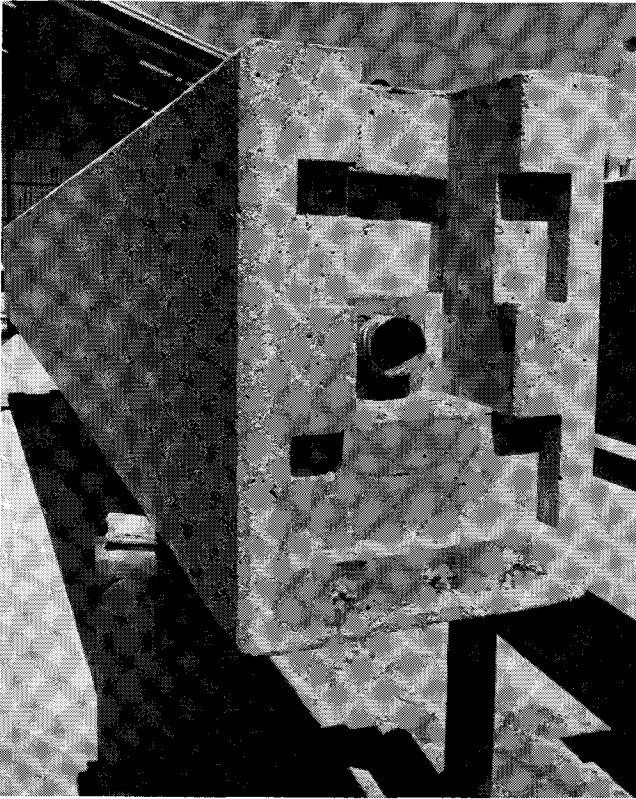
Shear key is formed in ends of precast beams. After sleeve-connecting beam and column tendon duct are secured, keyway is grouted with 6000-psi concrete.
